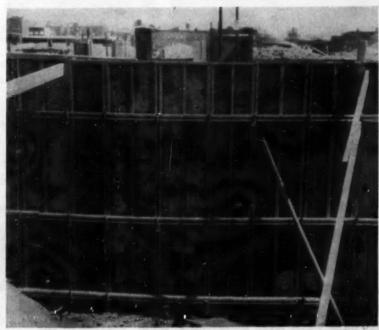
HOUSING PROJECT FORMS in New York City where reinforced concrete is the rule. These panels used by Driscoll Moccia Construction Co. are 4 ft wide, 12 ft high: minimize wales but allow for rapid pours. Twelve-ft walls are poured in 4 hr.
